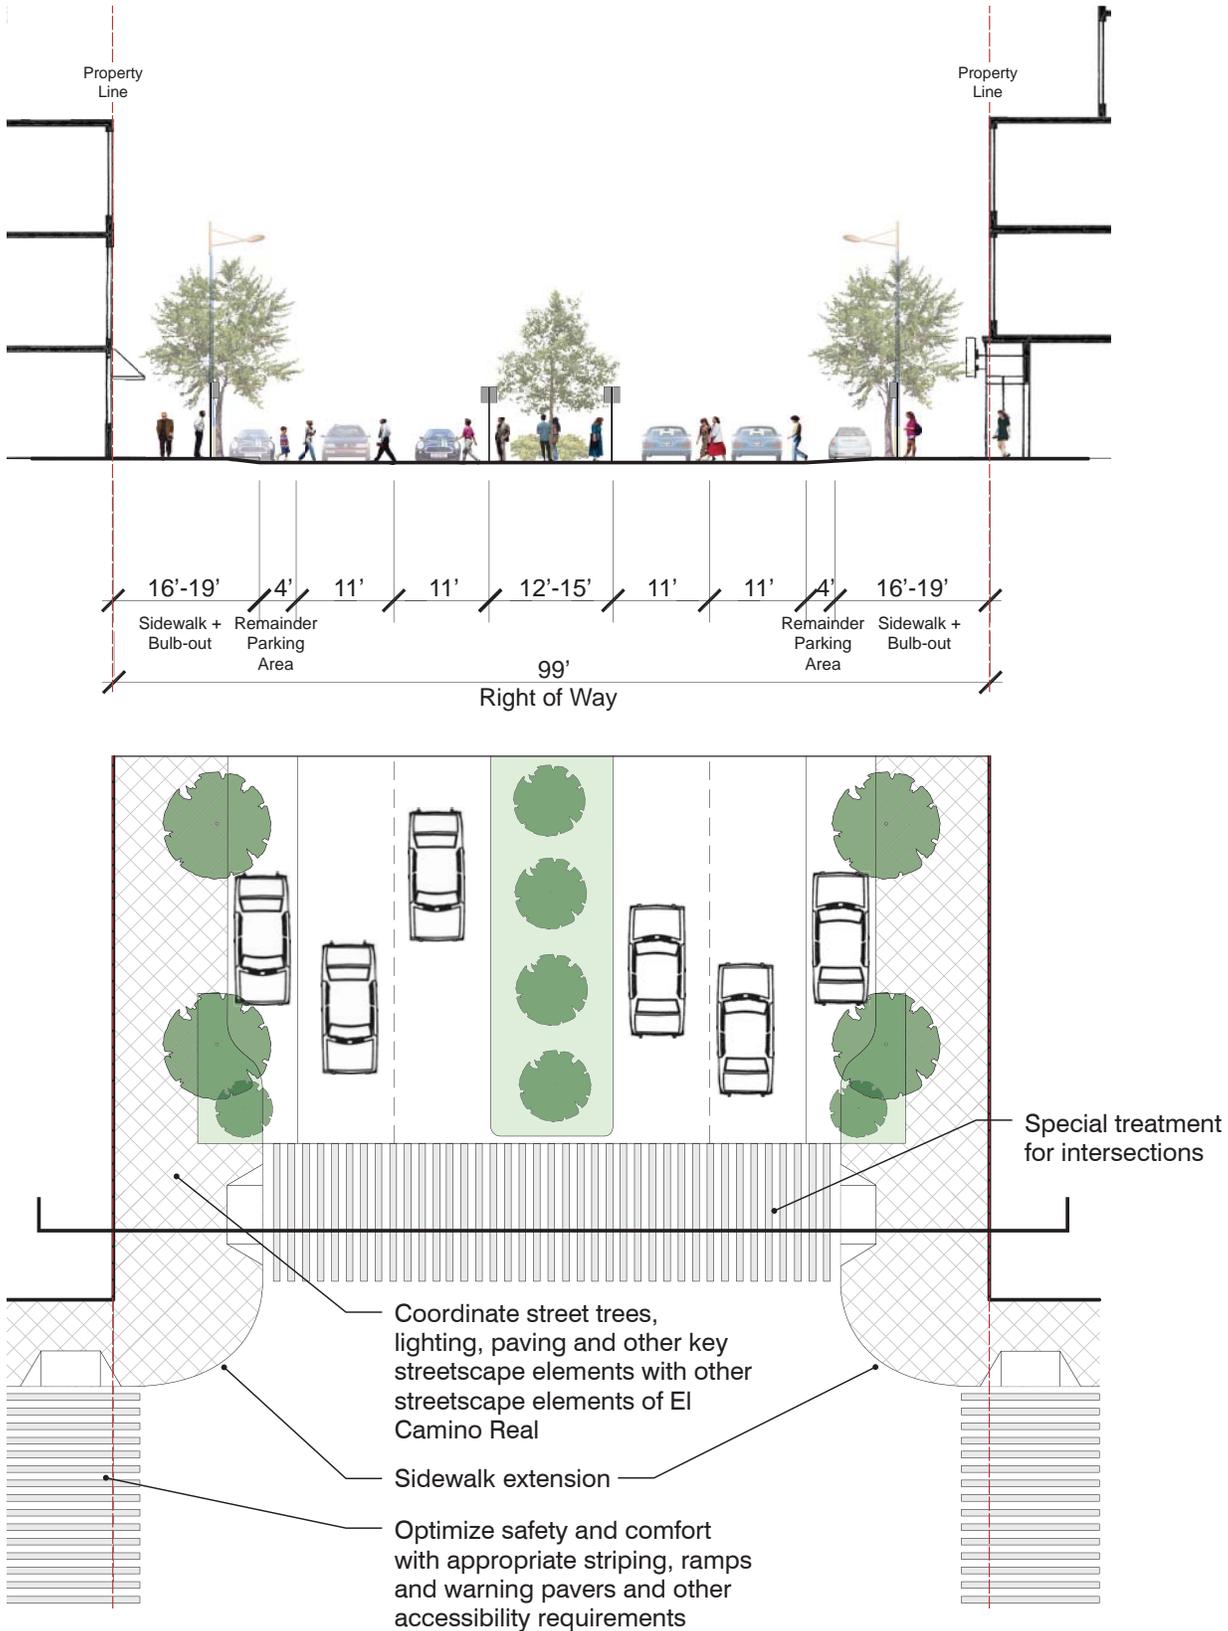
Typical intersection detail showing bulb-outs at El Camino Real and the interplay between parking and sidewalk (the sidewalk curves outward to create a parking bay)
